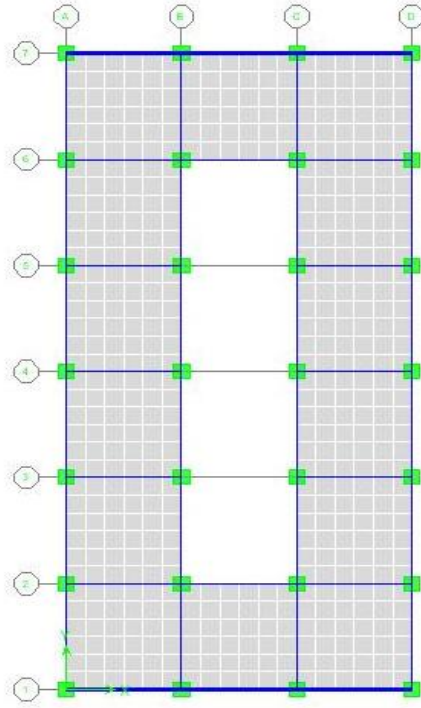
Rectangular building with opening Computer Generated Floor Plan
